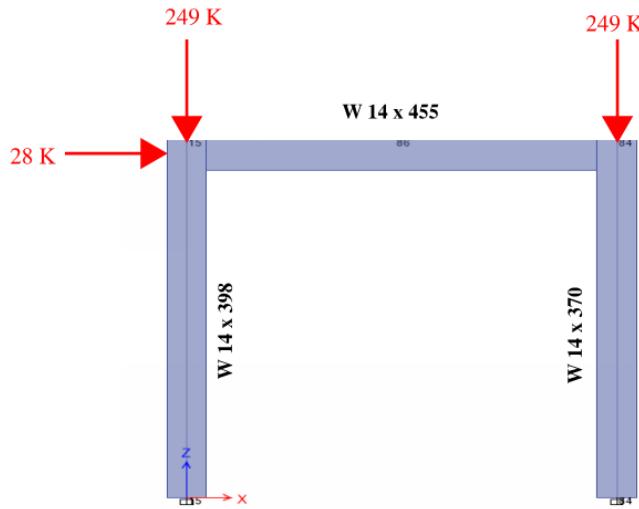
Elevation of Moment Frame #3 @ 4th Floor
